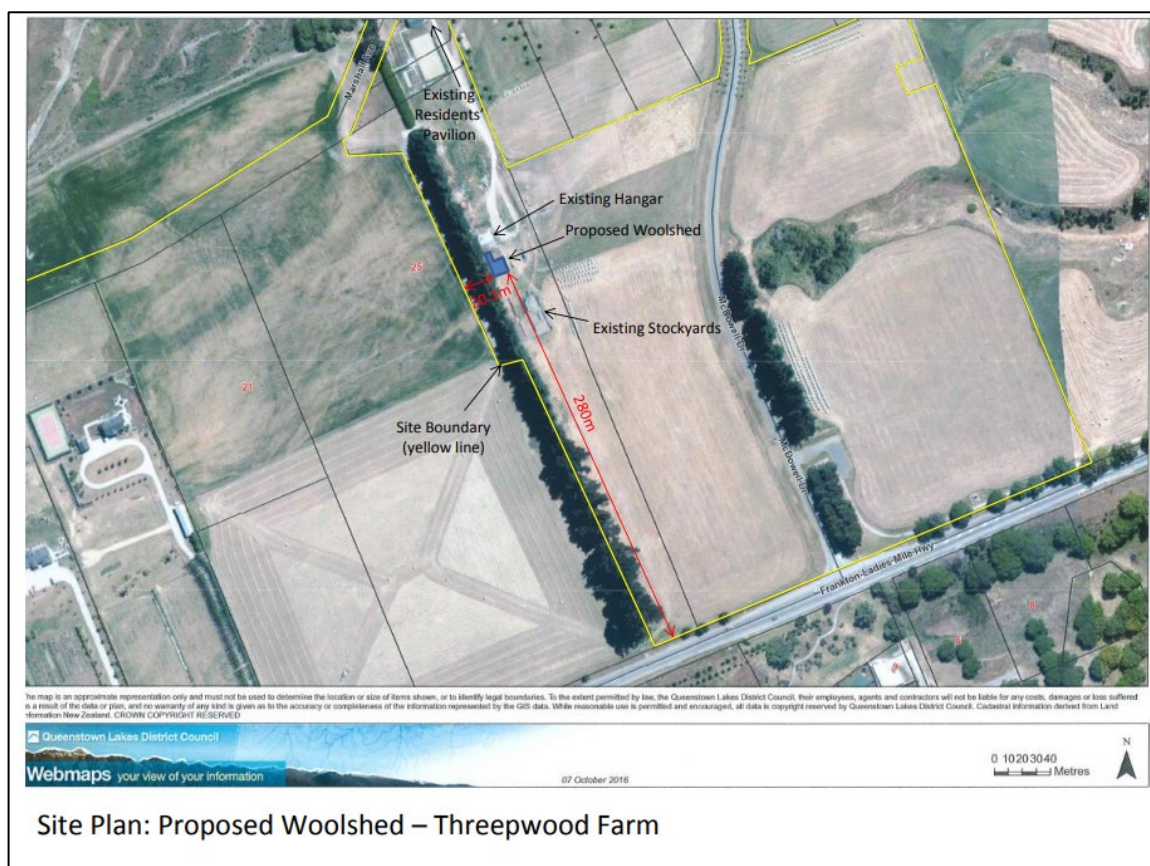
Site Plan, taken from RM161019, 28 Strains Road
